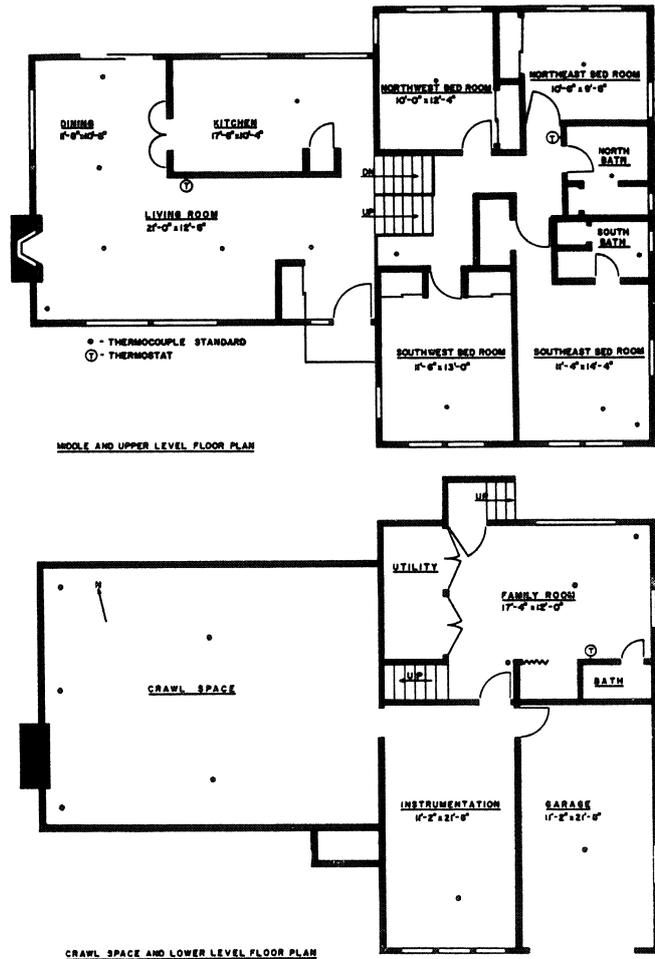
NWAHACA Research Residence No. 4 floor plans and room dimensions
